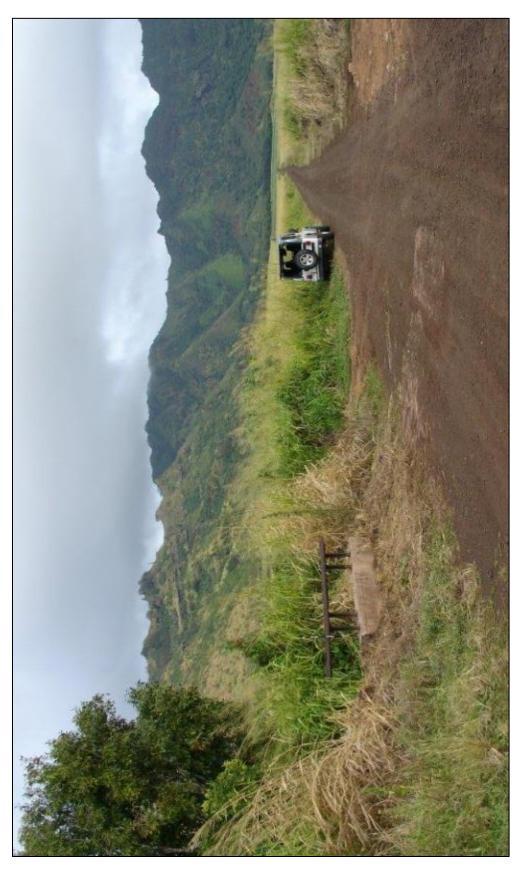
Site -2260 bridge showing parapet, railing, and bridge deck. View to northwest.
